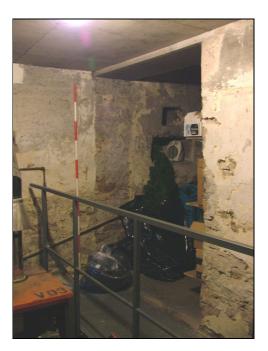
Ground floor of pele tower showing scarring of former masonry cross wall with niches set in wall to the right (Scale = 2m)
